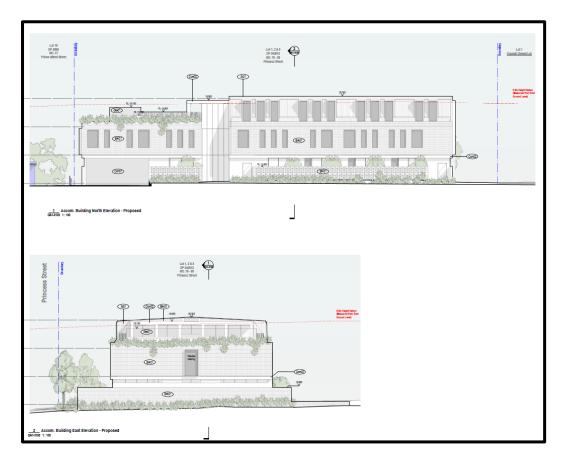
Motel Accommodation Elevation (North and East) (Source: H&E Architects).
